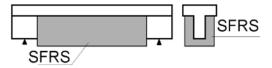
A Scheme of Strengthening a Concrete Beam by adding SFRS (Maidl 1995).
